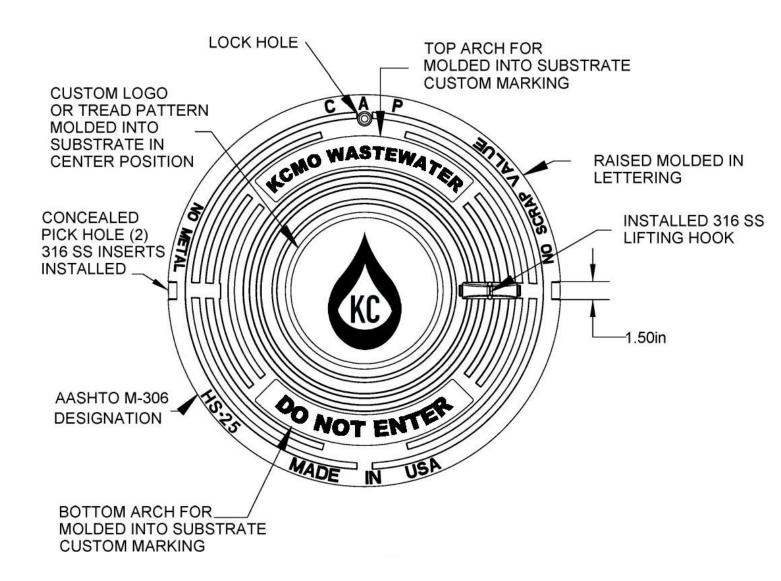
Standard Sanitary Sewer Manhole Markings For Composite Castings
